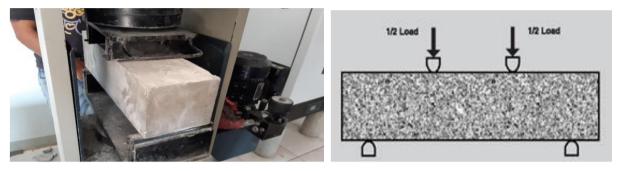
ASTM C78 (flexural strength of concrete-using simple beam with third-point loading)
